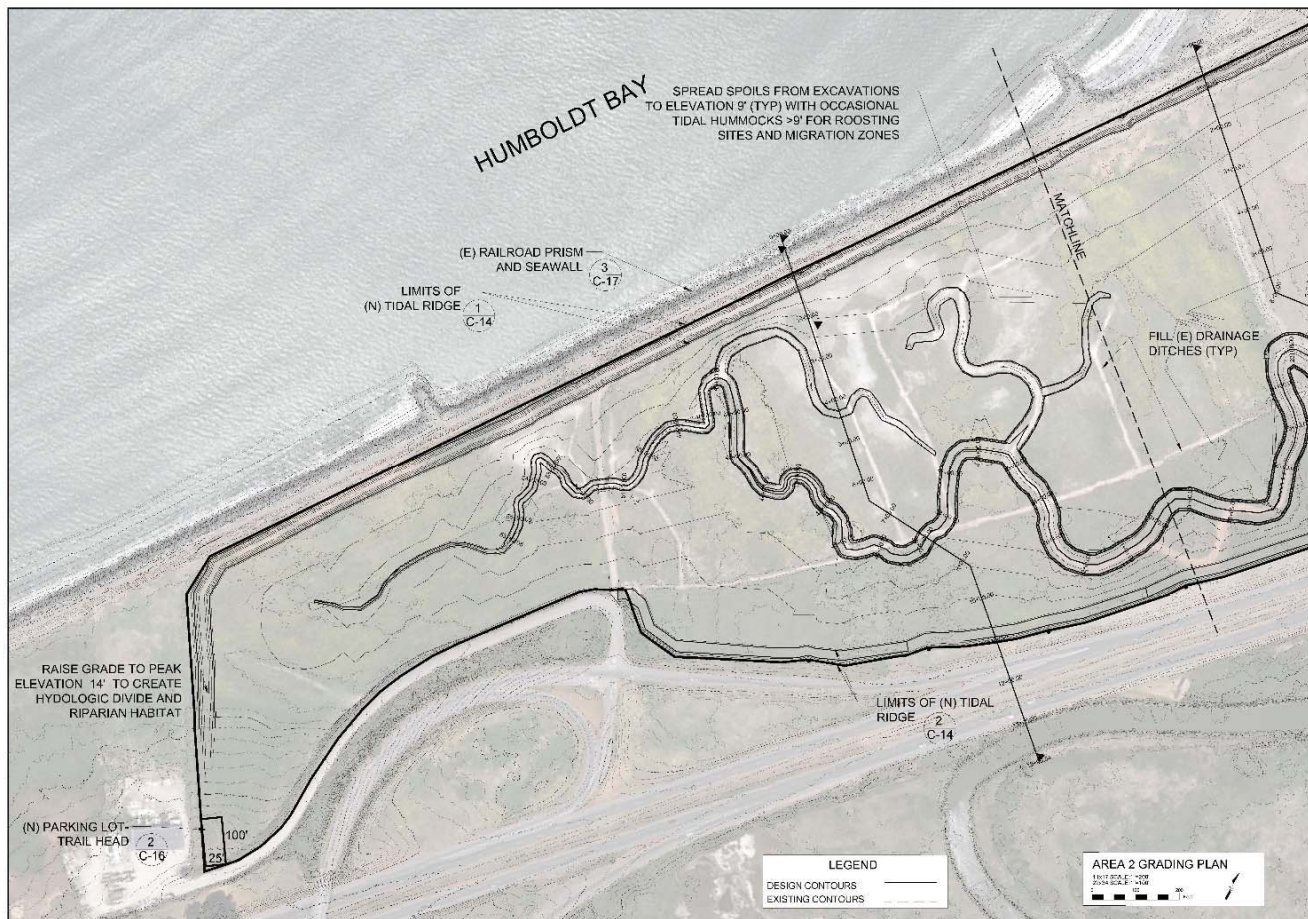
Overview of Area 2 design elements, southern end (Appendix A, Sheet 12B).
